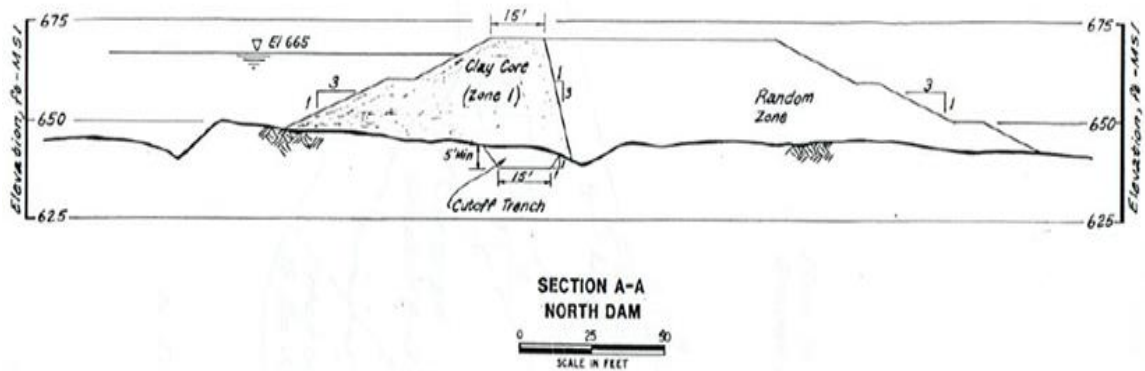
North Dam cross-section (Eckelkamp, 1986). Elevations and distances are in feet.
